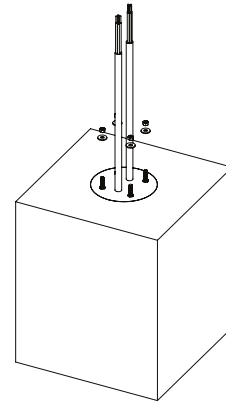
Cross-section of the foundation set cast in the concrete
